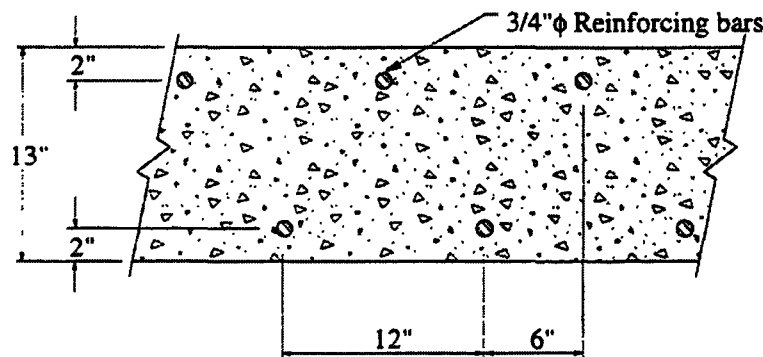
Bridge IV: Assumed configuration and reinforcing details at crown of arch.
